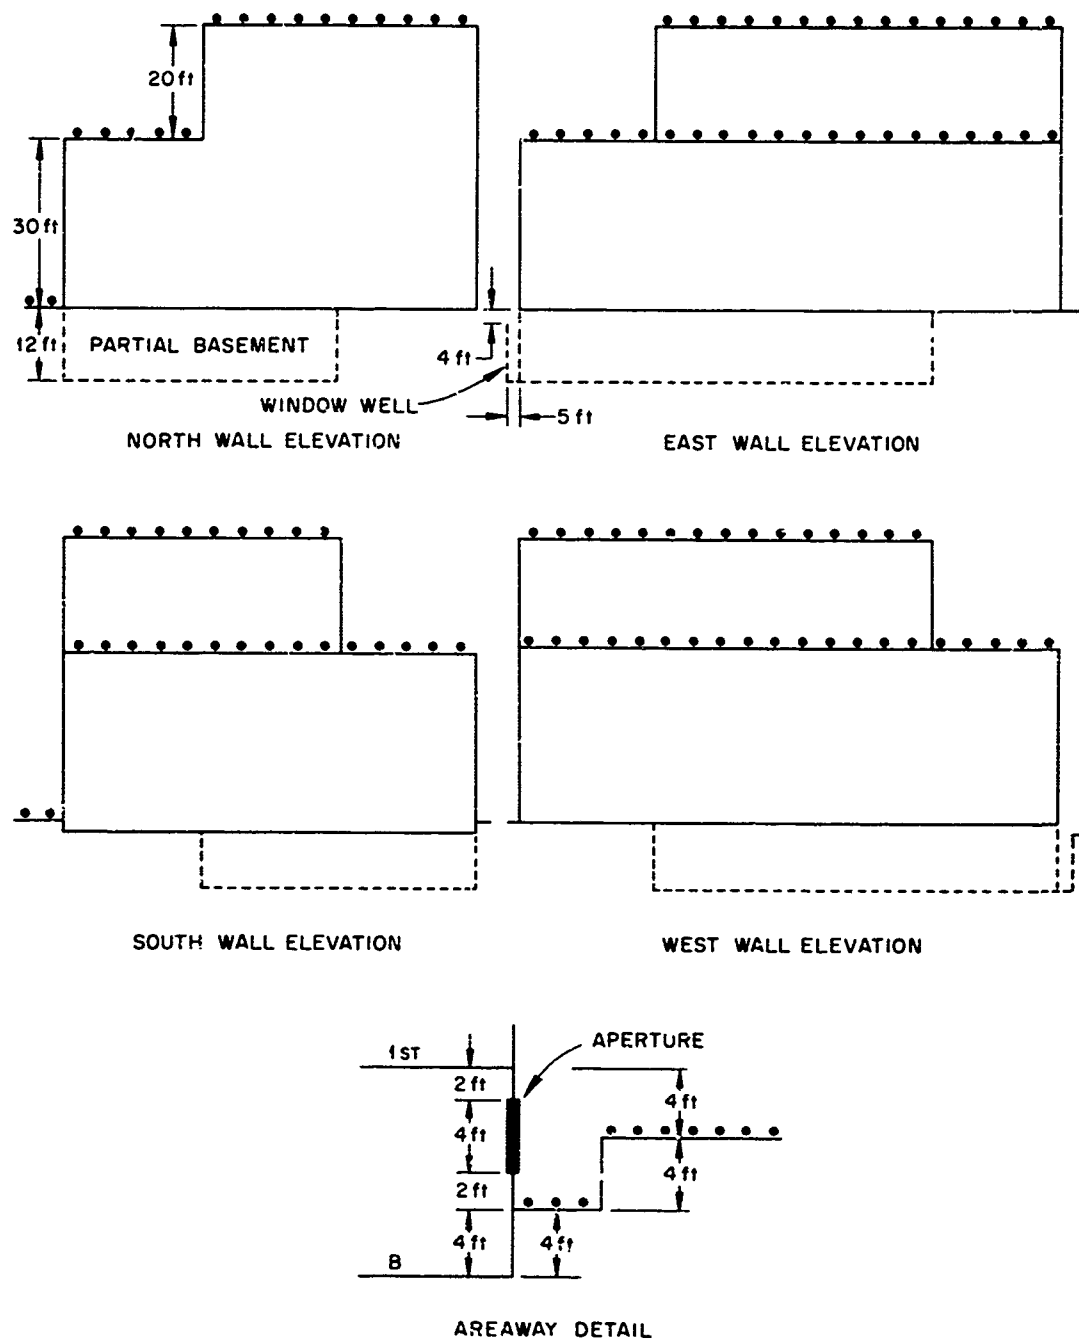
Building No. 5 Elevation Views and Areaway Detail.
